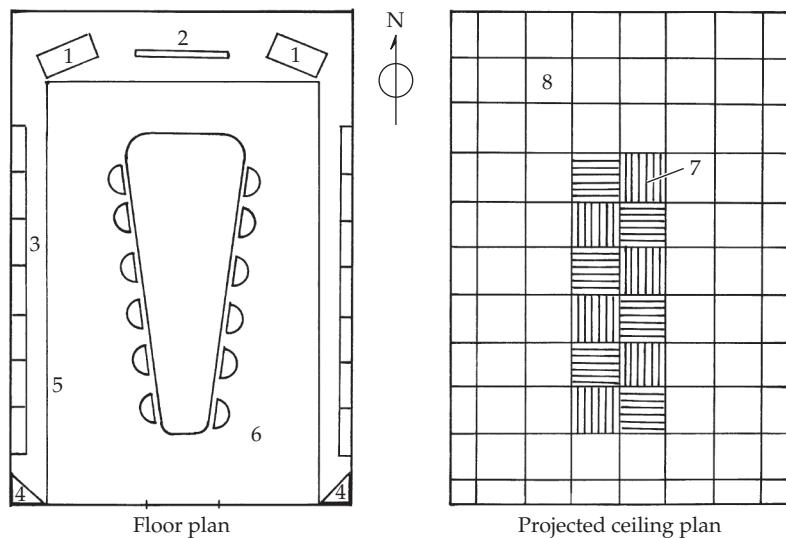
Floor and ceiling plans for a teleconference room.
